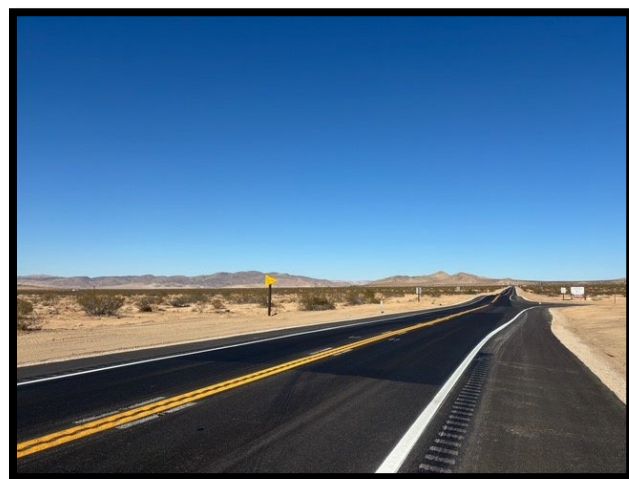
SR-247 After Road Improvement Near Larrea Rd Photo
